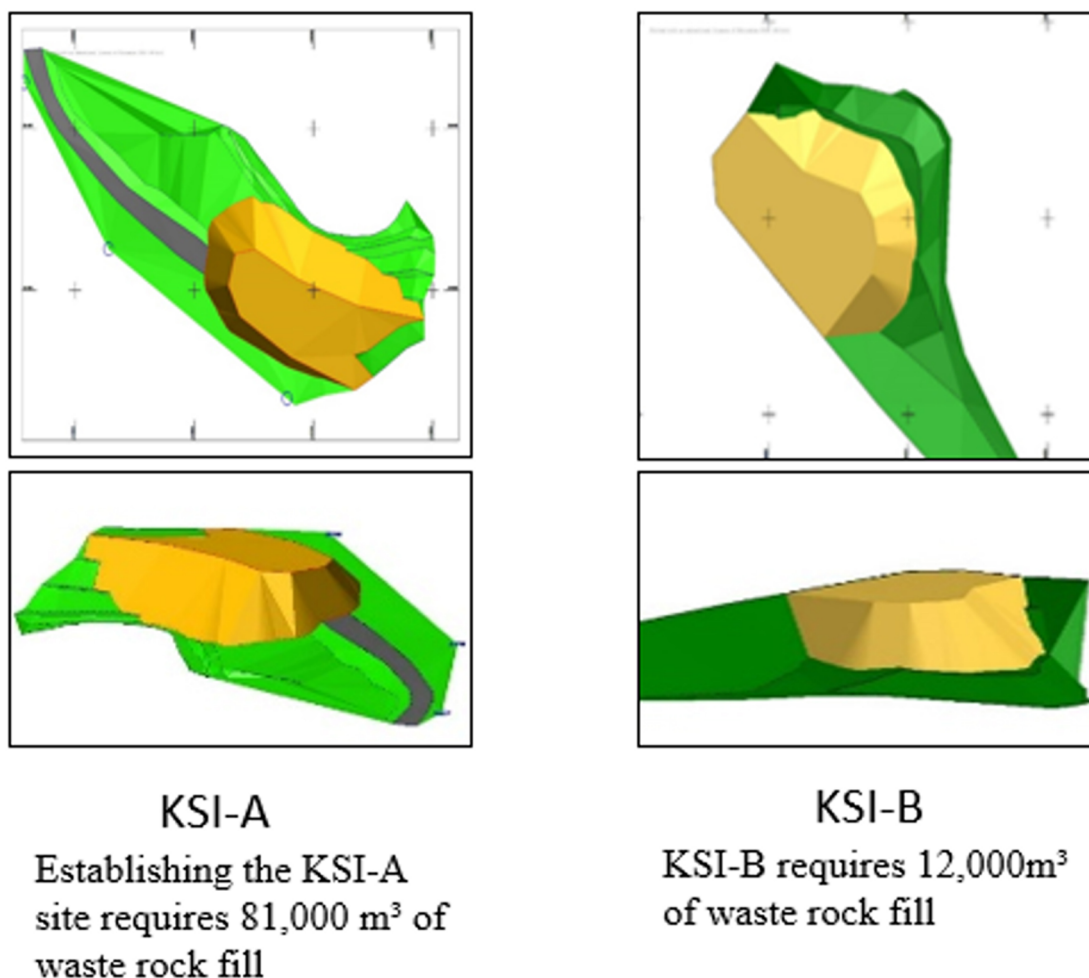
Plan view of Stockpile KSI-A and KSI-B.
